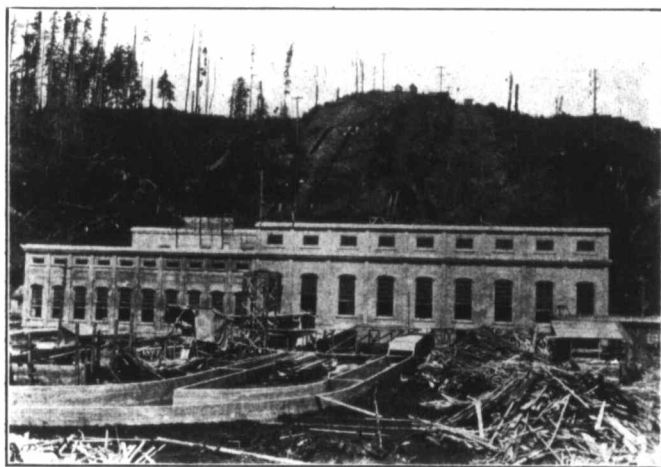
Front view of completed power house building, showing tailrace flumes.
